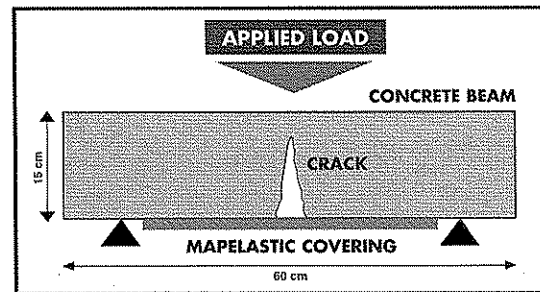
Protection of a hairline crack with Mapelastic on the underside of a concrete beam subject to flexural stress
